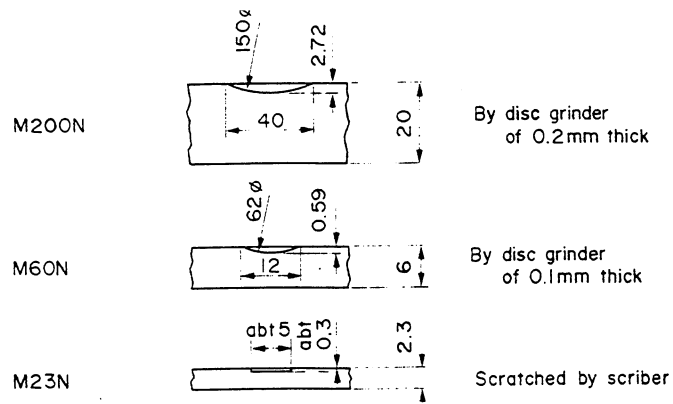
Shape of notch at bottom flange; from Ref. [2.36]
